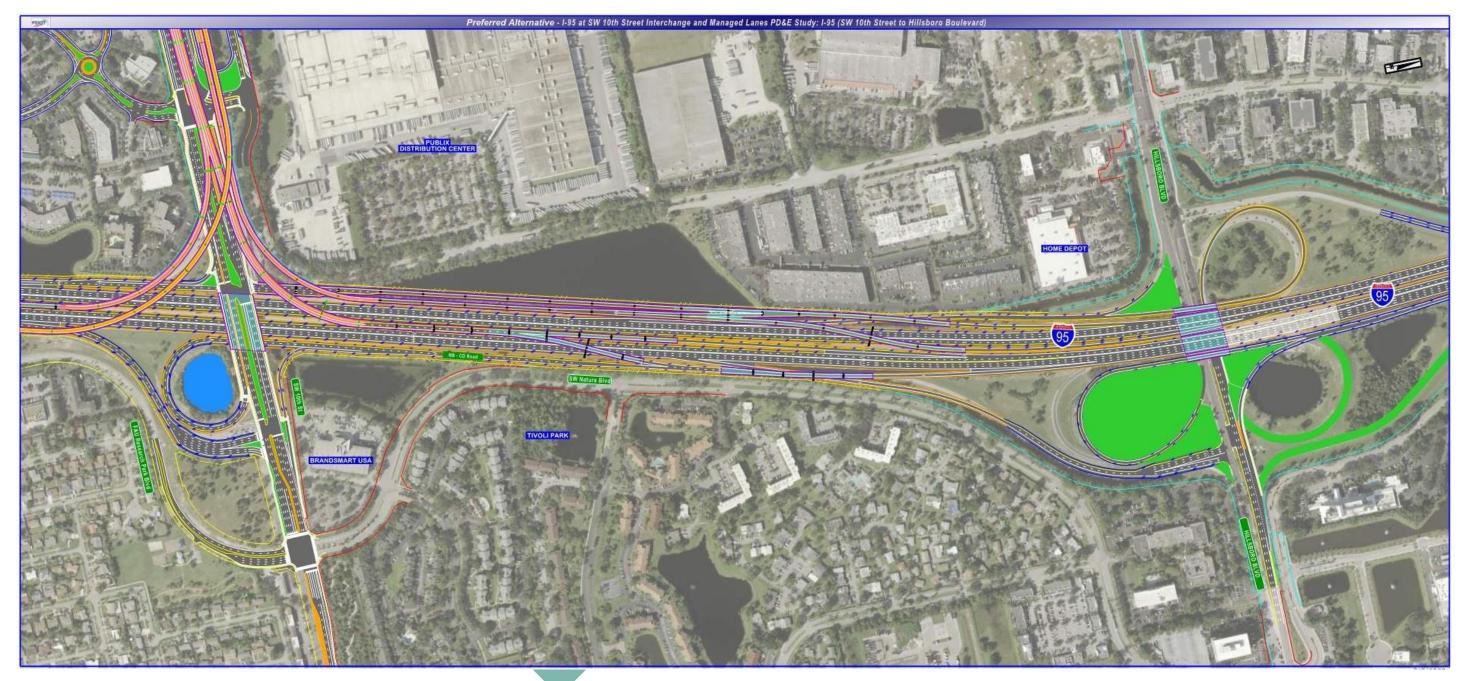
I-95 – Preferred Alternative Concept Plan (N of SW 10 St)
